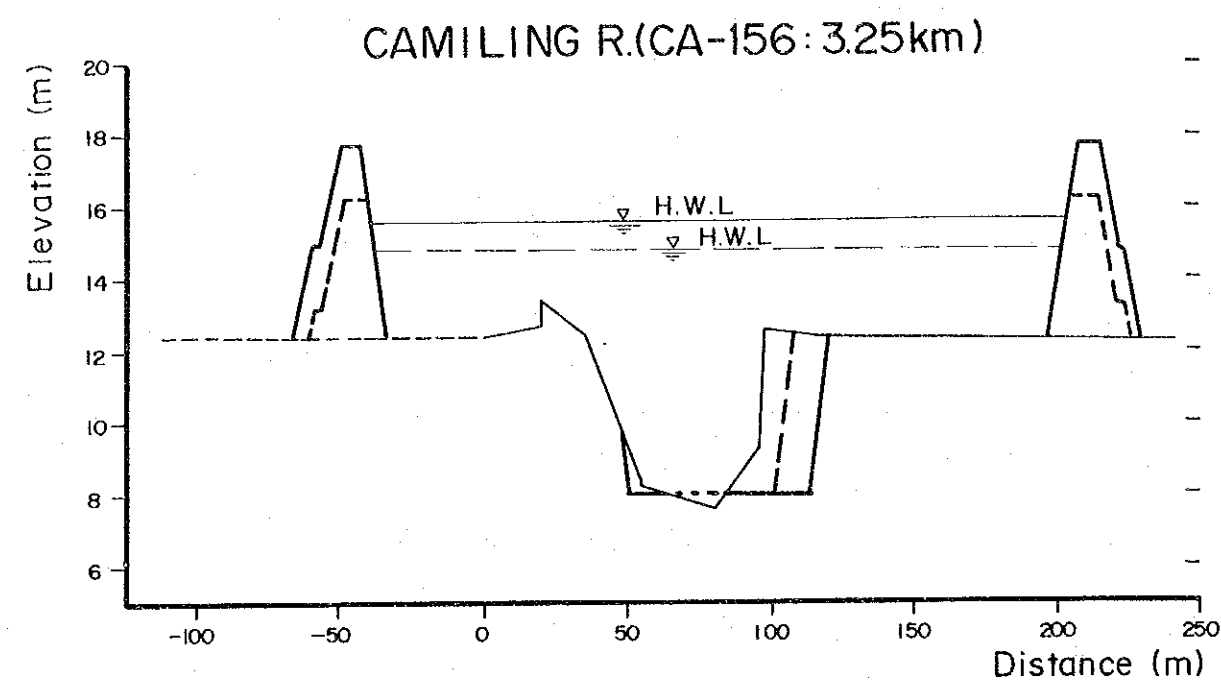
TYPICAL CROSS-SECTION OF CAMILING RIVER
